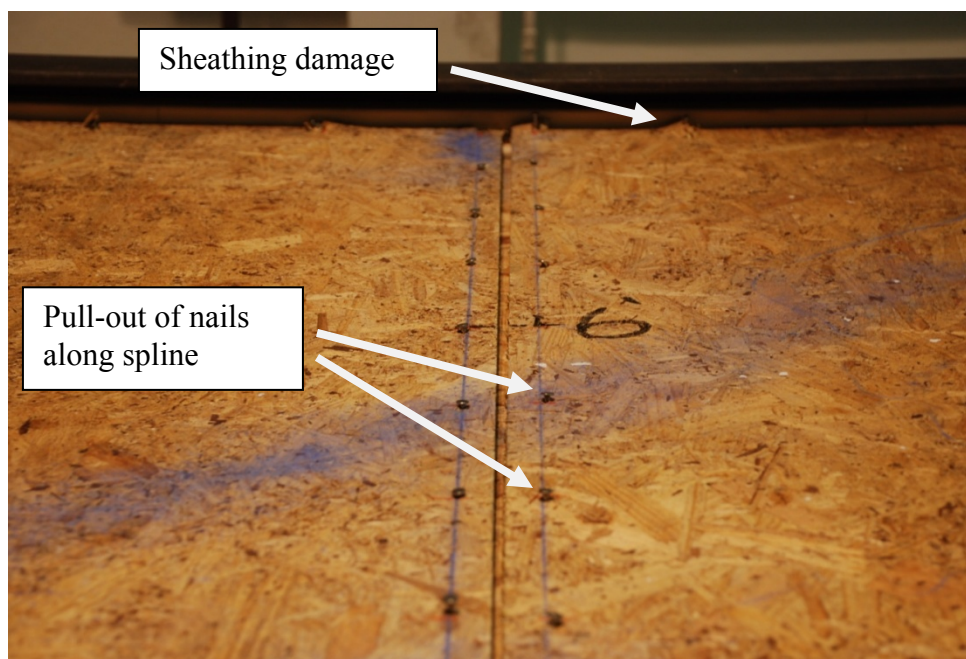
Pull-out of nails along spline and damage to sheathing along top plate after cyclic loading of Specimen A1Bearing-3C
